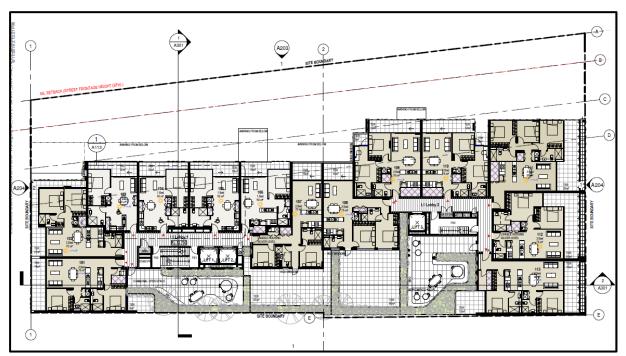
Proposed First Floor Plan (*Source: Brewster Murray)
